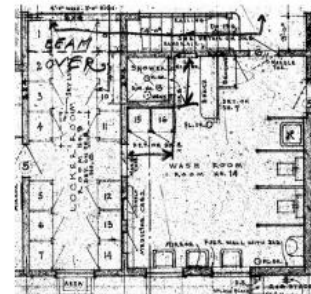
Drawing of wash room floor plan (W. Horace Austin, Sheet 8)
